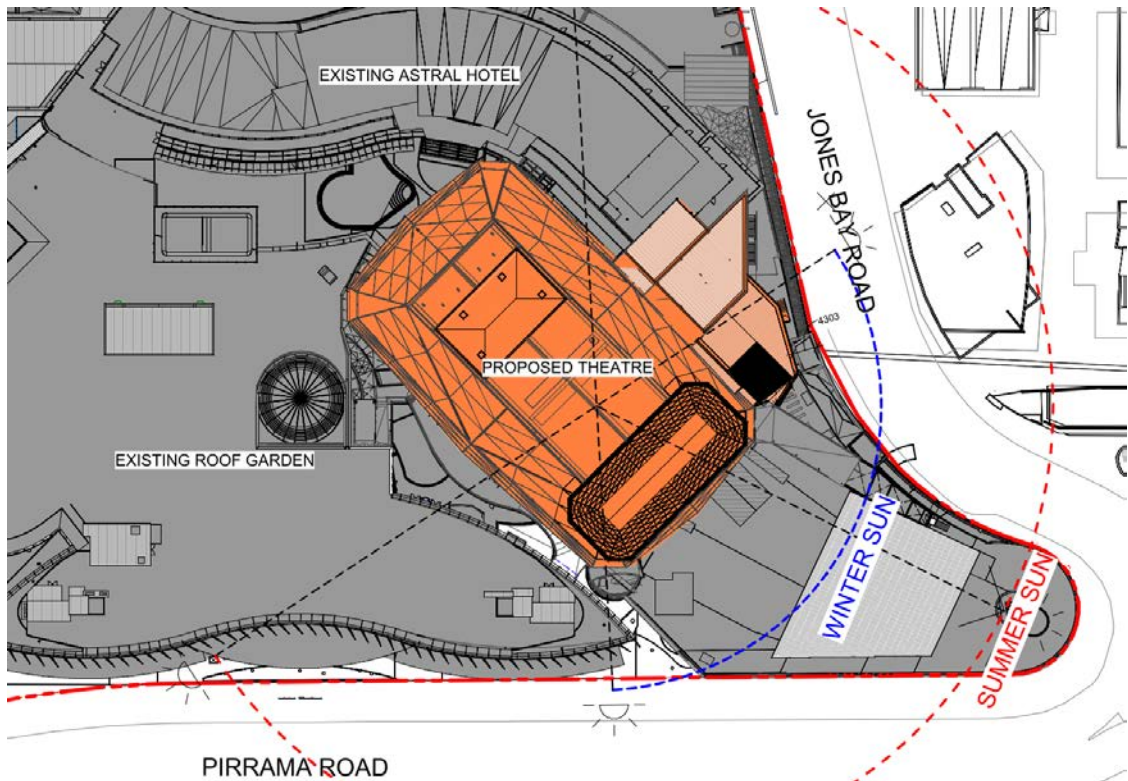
| Setback of dressing room and plant expansion (Source: RtS)
